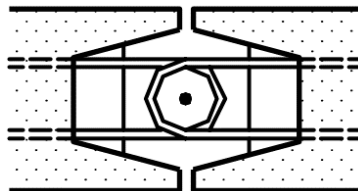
Typical shear key connection at a vertical joint between wall panels
